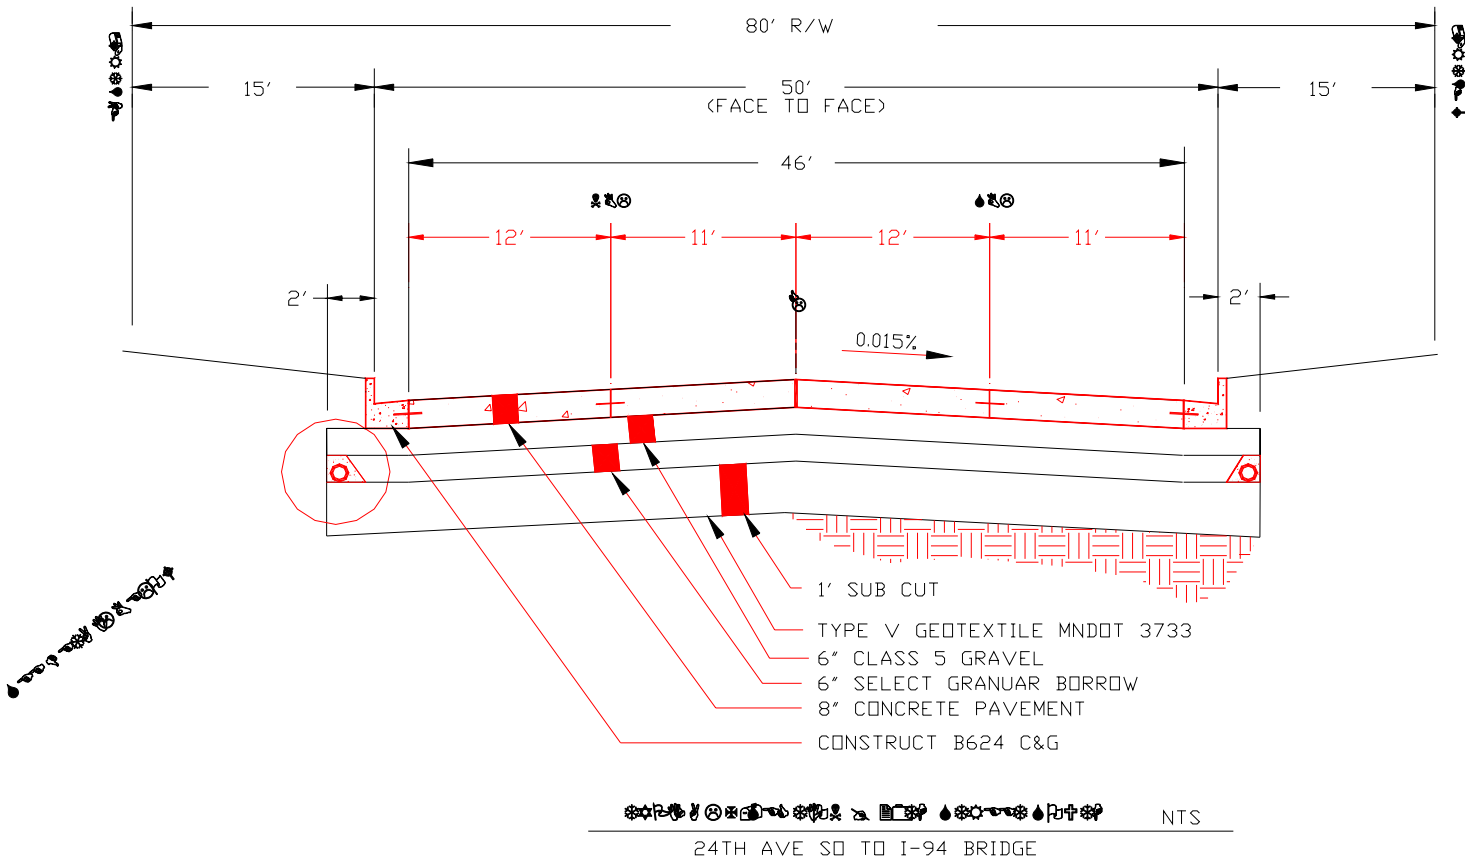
Typical PCC pavement construction plan for Waseca County.
